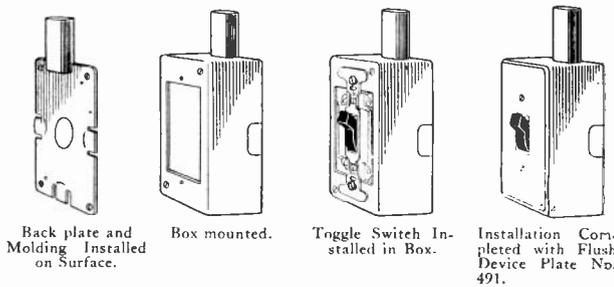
These views show the various steps in installing a switch in the outlet box of a metal raceway system.
